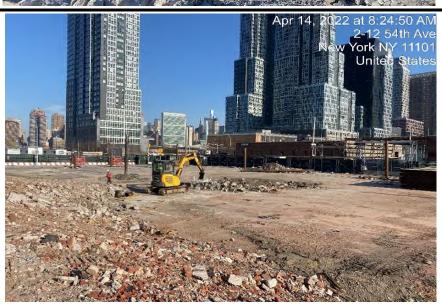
Civetta continues breaking up portions of the slab of the former building, facing north.
